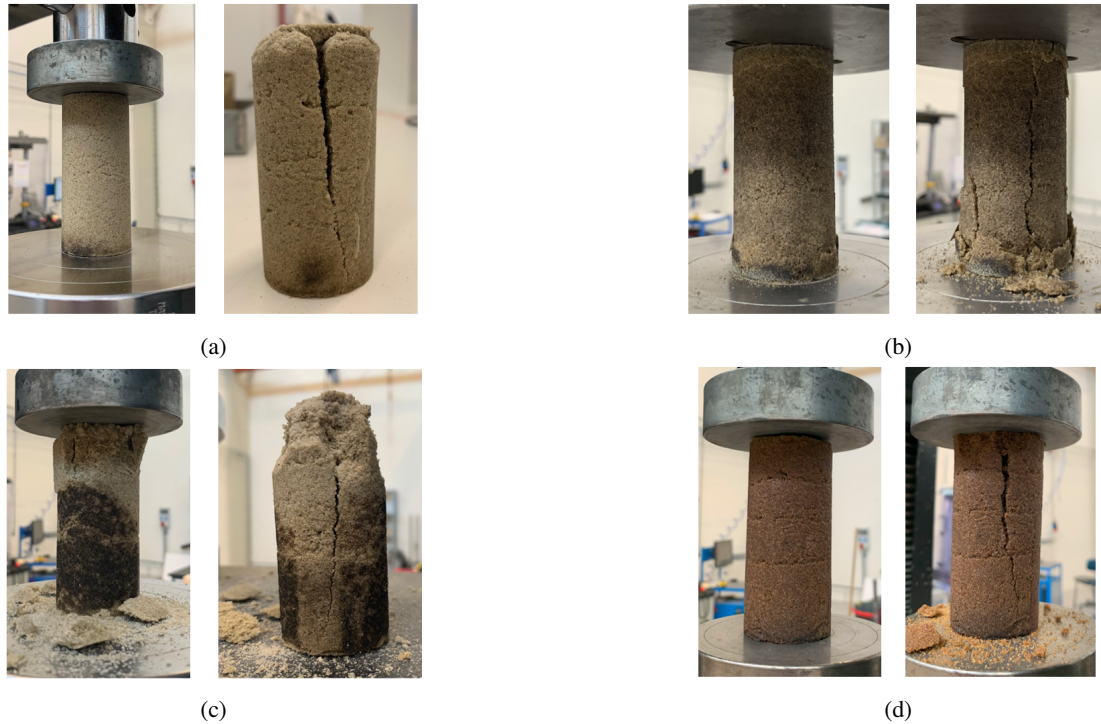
Photographs of UCS samples: (a) SC20-TC105-T5; (b) SC40-T105-T1; (c) SC15-T105-T1; (d) SC15-T170-T1.
